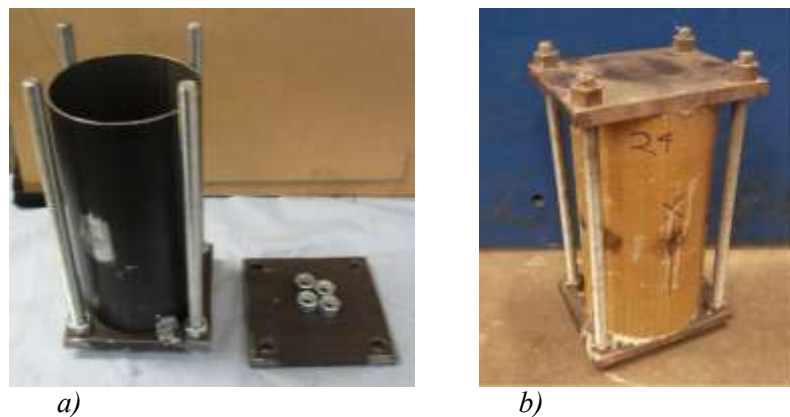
Steel end caps and threaded rod used to create the prestressing rig: a) steel tube specimen prior to casting of control specimen; b) CFFT specimen during concrete curing
